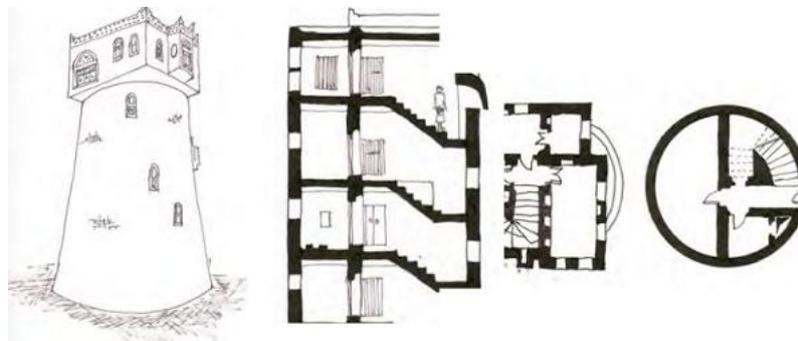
Two plans, a sector, and a facade of a guard tower, from which the idea of the tower house in Shibam was derived [12].
